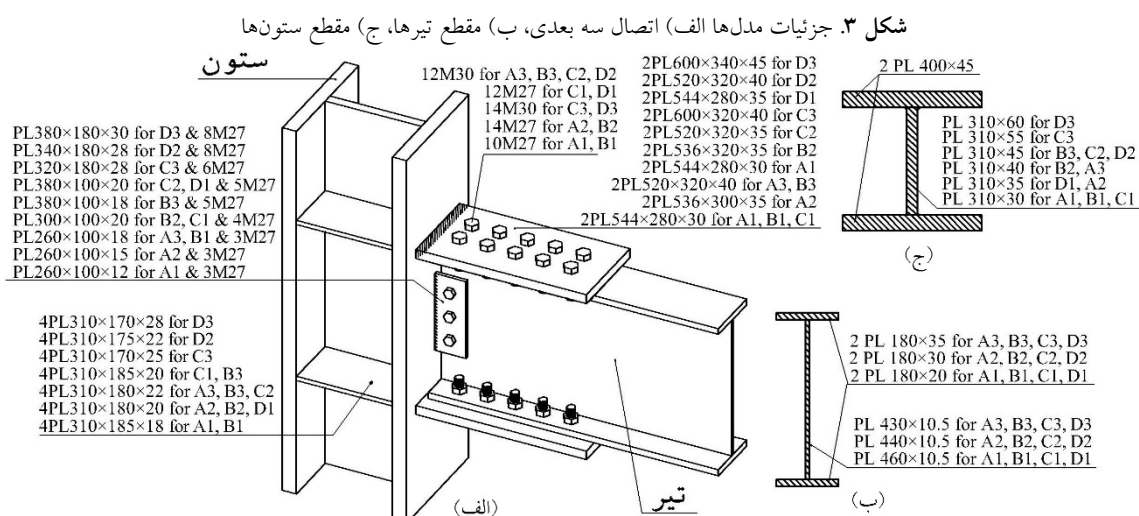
Details of specimens, (a) 3D connection, (b) Beam section, (c) Column section
